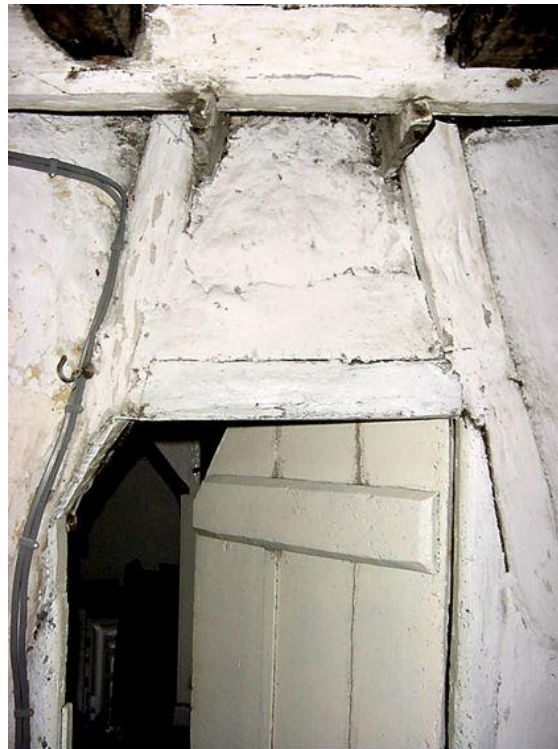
Poor workmanship - Pseudo-cruck constructed door frame with every scantling pinned in with wrought-iron nails [3].
